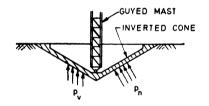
INVERTED CONE AS FOUNDATION FOR GUYED MAST
